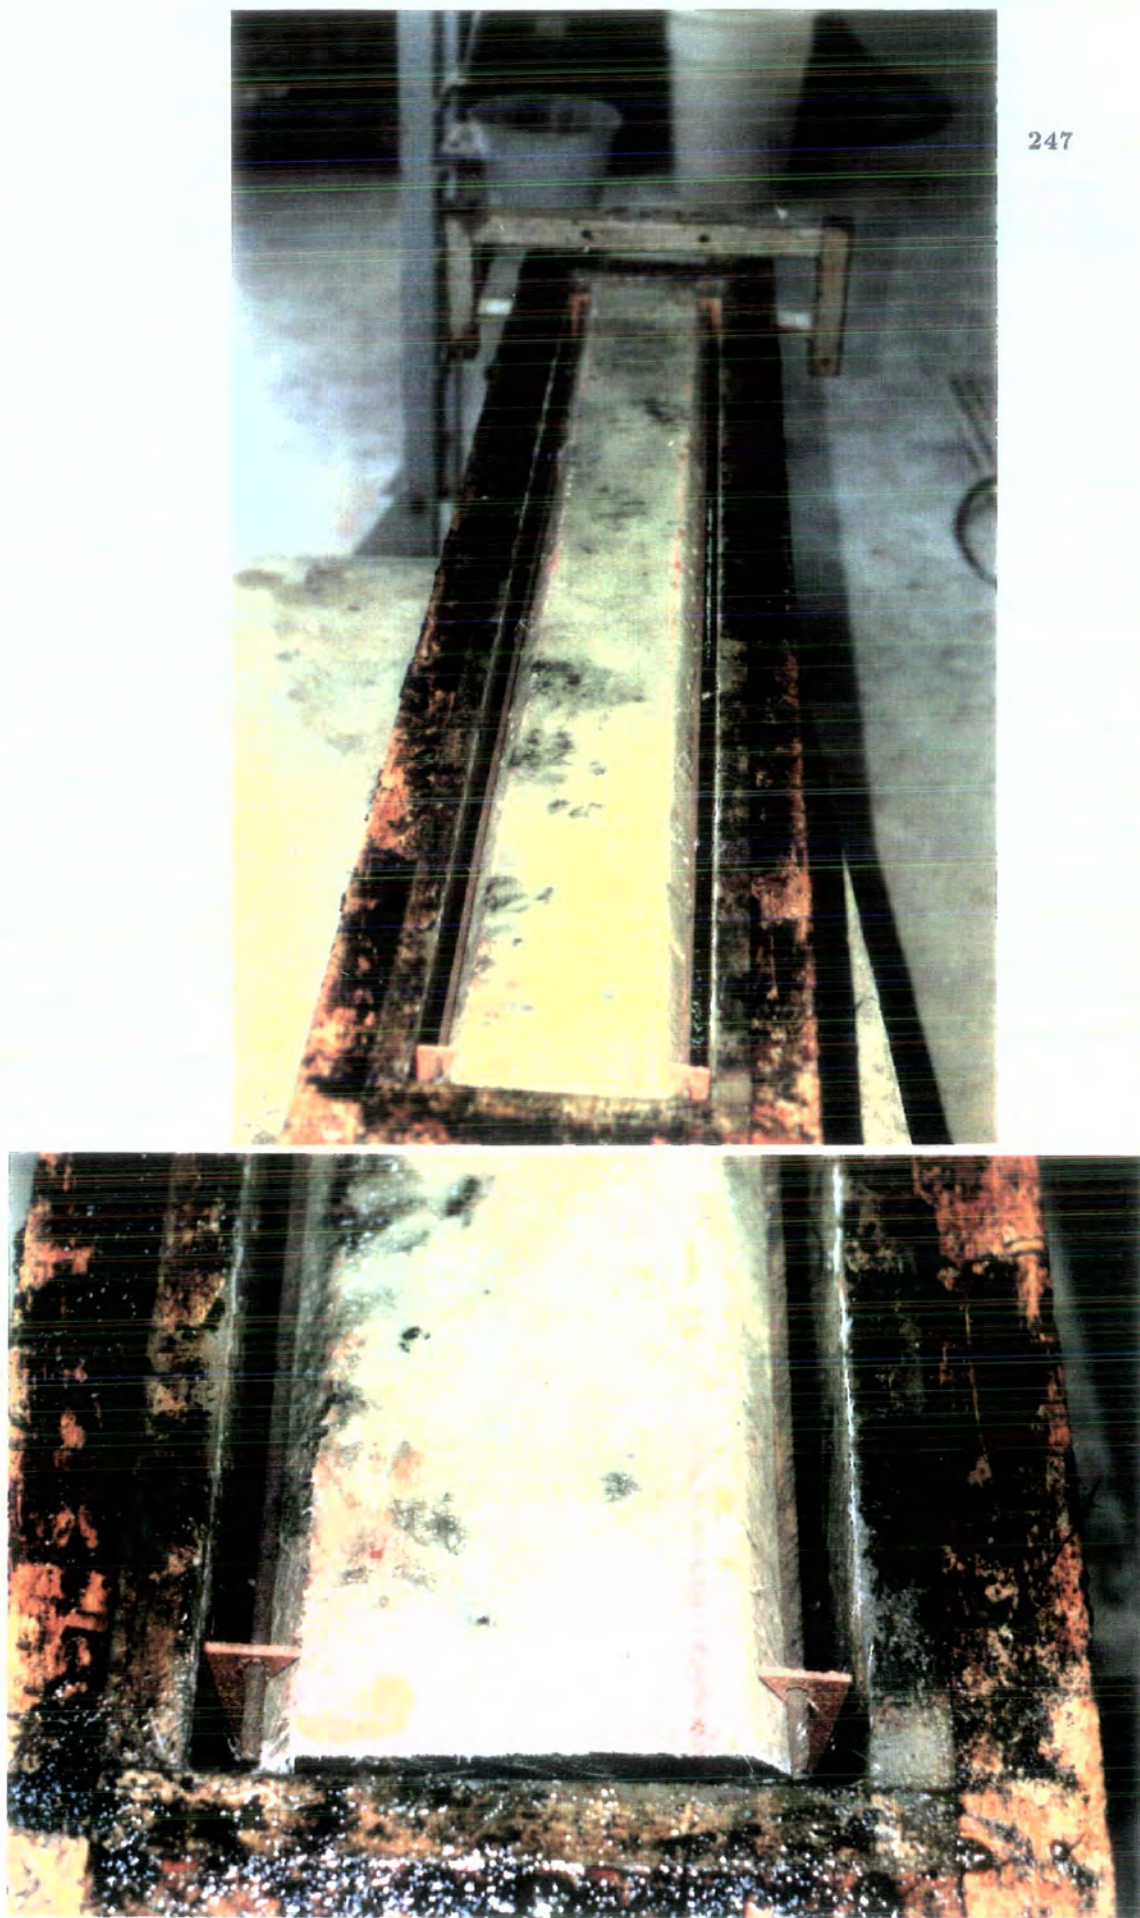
Positioning the core and the steel bars in the mould over the first cast phenolic concrete skin.
